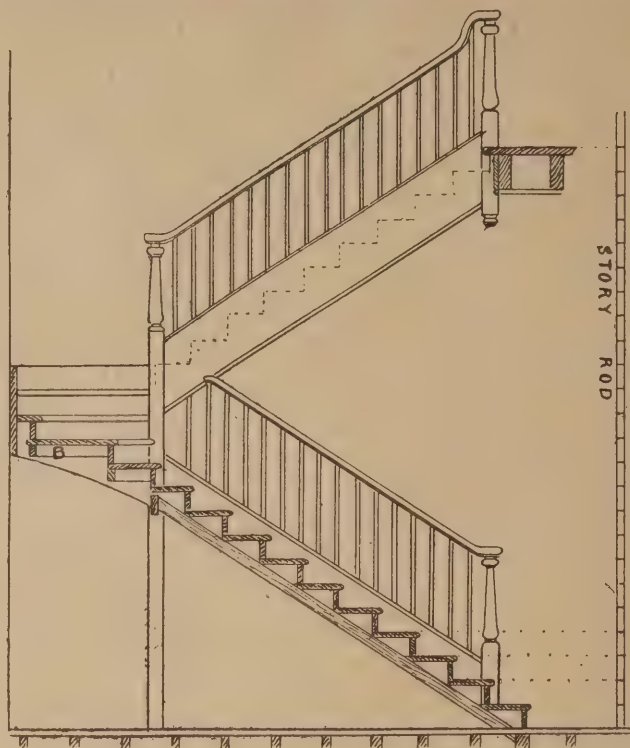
ELEVATION OF DOG-LEGGED STAIRS.
